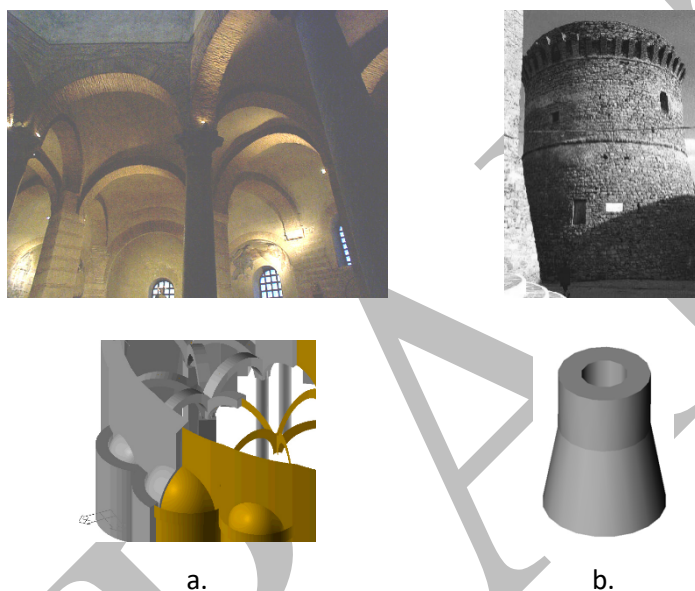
Modelling of the masonry structures with FEM and CCLM: church with thin walls (a) and tower with thick walls (b)
